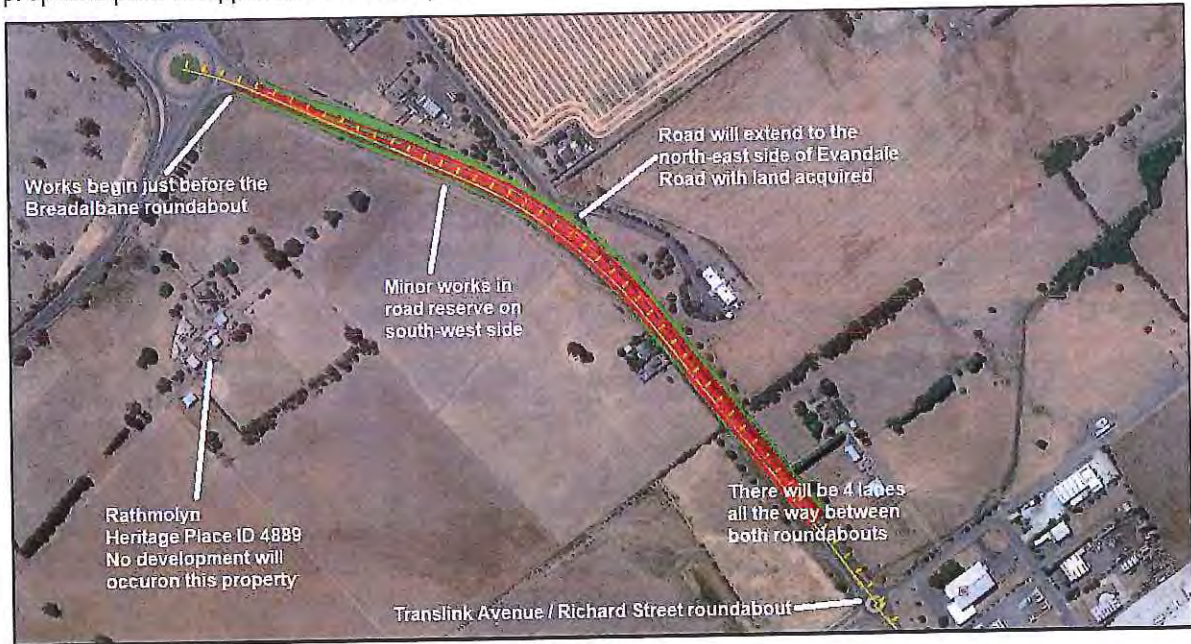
NORTH-WEST SECTION OF THE ROAD WORKS
